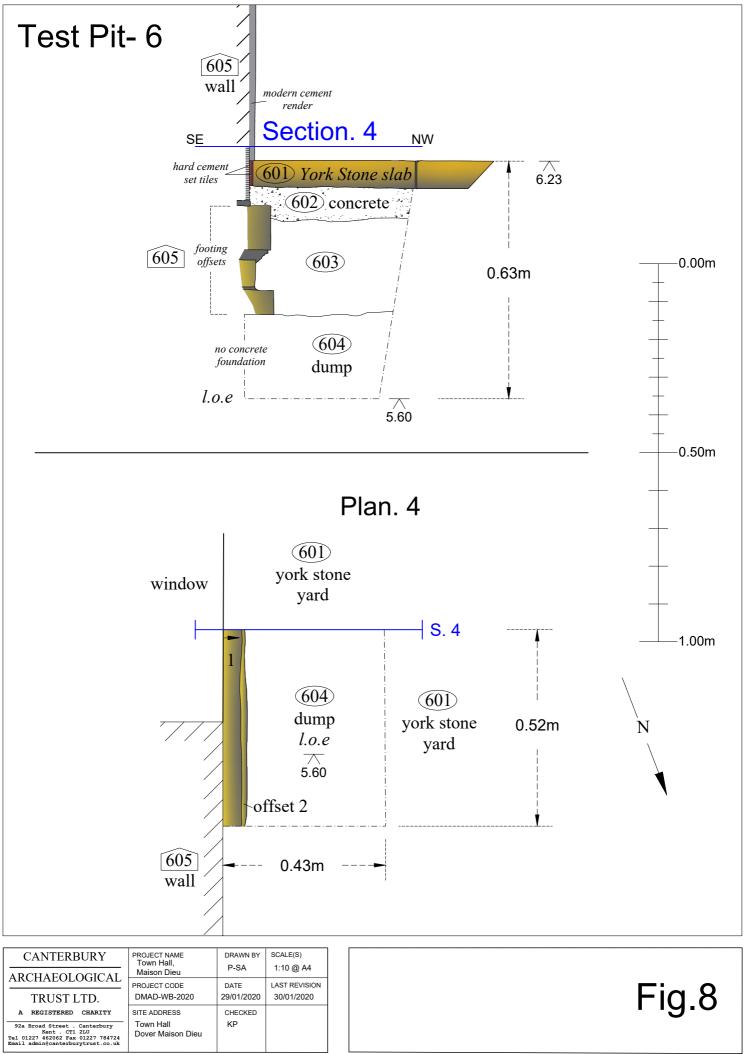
Plan and section through recorded deposits, Test Pit 6
